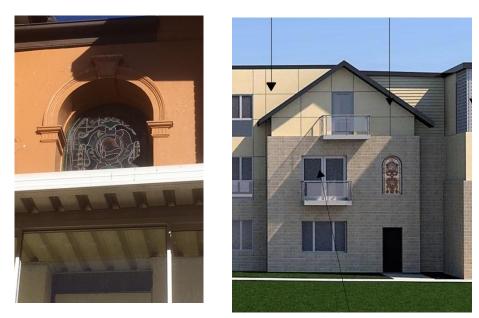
and 14: Existing stainglass window of Agincourt (LHS) and proposed reuse of the stainglass window (RHS)
